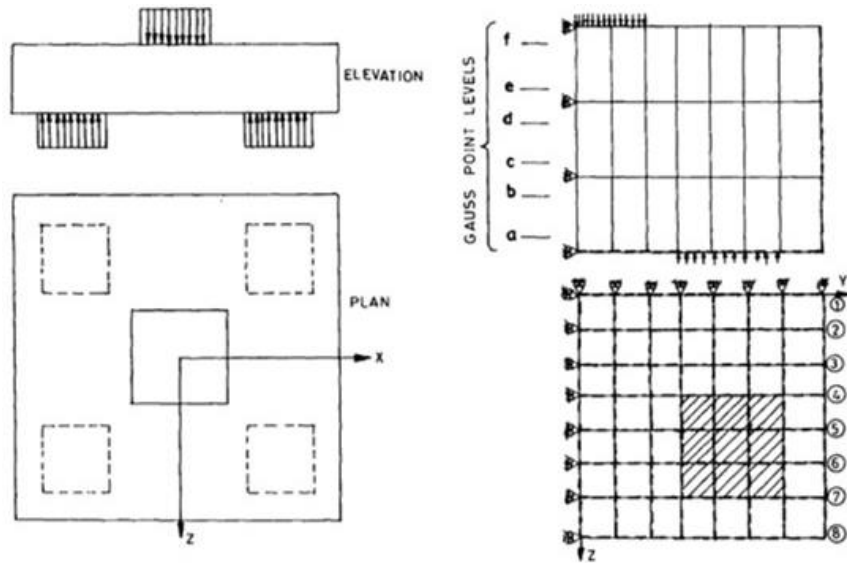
Finite element mesh for one-quarter of drilled shaft footing with slab-type reinforcement layout (Sam and Iyer, 1995)
